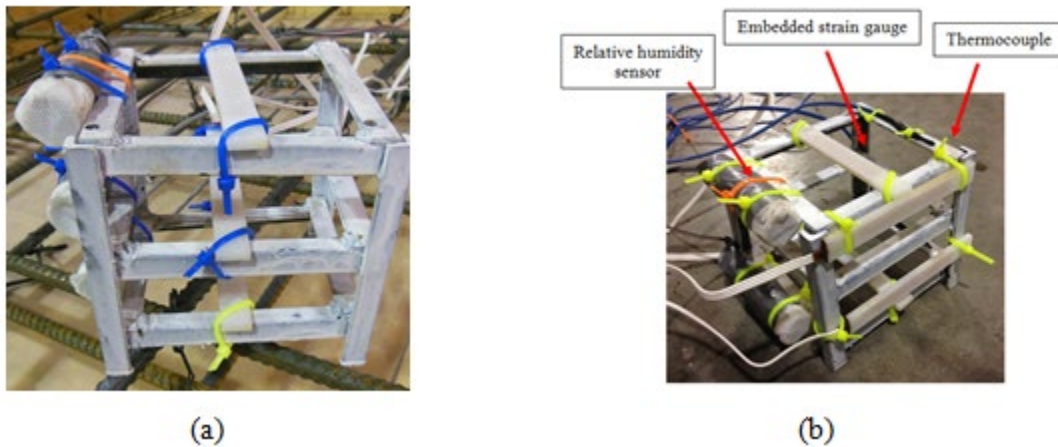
Instrumentation layouts for (a) Layout A: 3 embedded strain gauges in longitudinal direction, 3 thermocouples and RH sensors, and (b) Layout B: 4 embedded strain gauges (2 longitudinal and 2 transverse directions), 2 thermocouples and RH sensors
